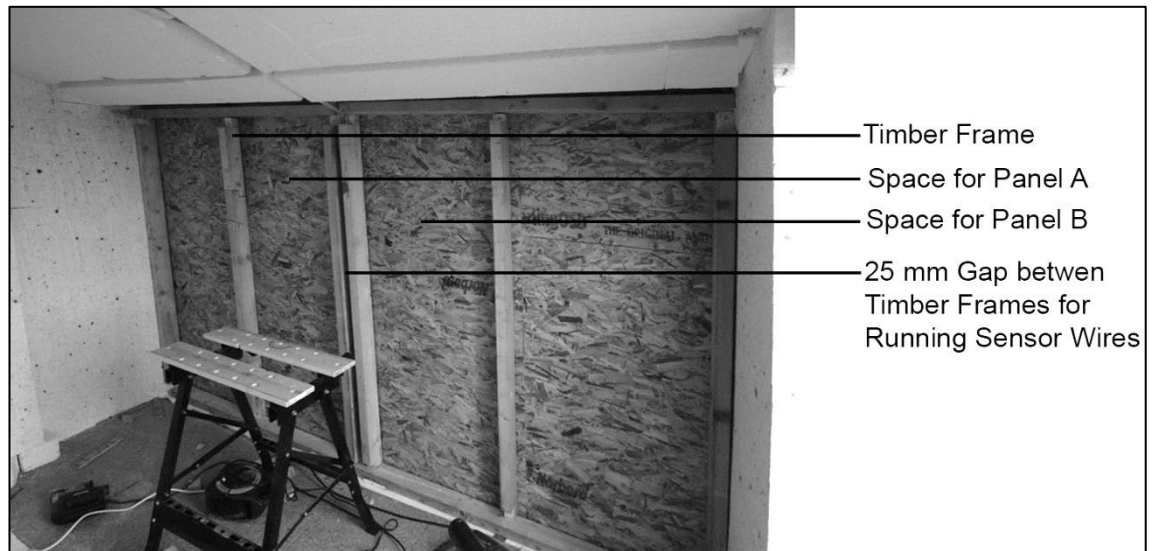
Installation of the OSB boards and timber frames for wall panels.
